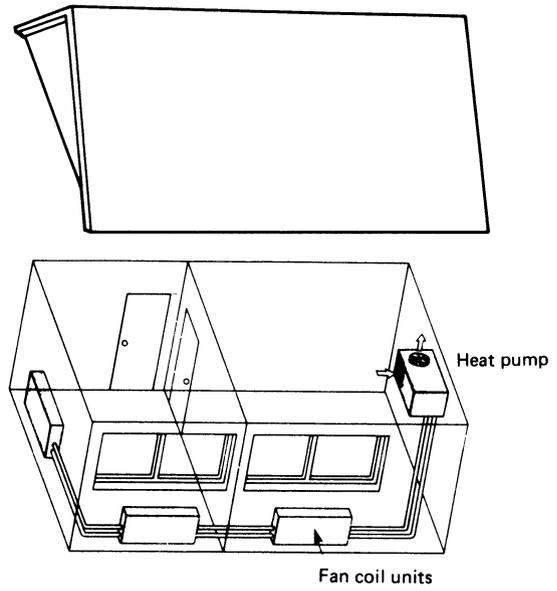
An air-to-water domestic heat pump. The heat pump is shown inside the roof space but it can be sited in the garden
